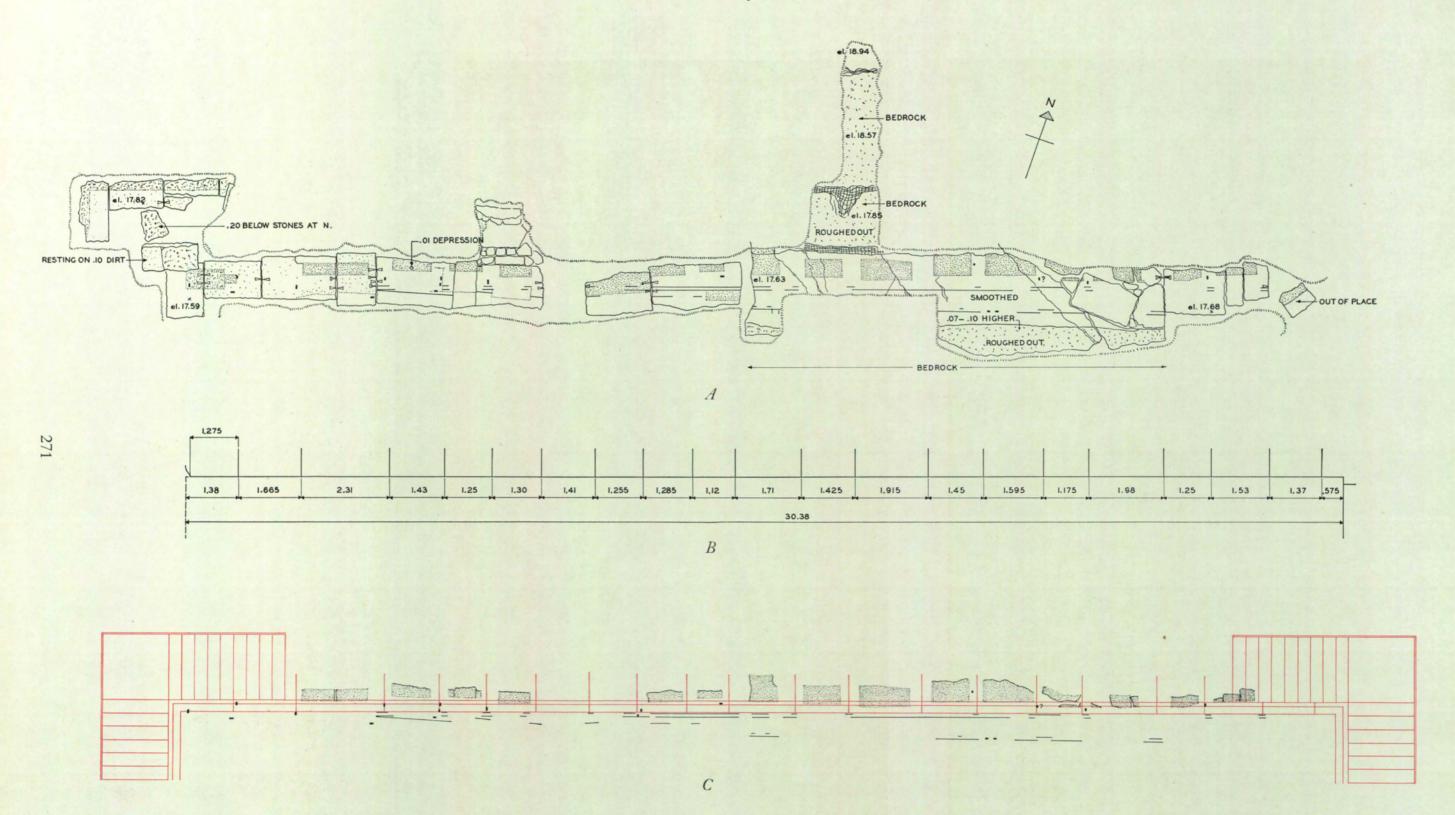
Palace G. Scale, 1:100. A. Plan of Area Tested along South Front of Site. B. Spacing of Stones of Façade of Artaxerxes III (from Palace H).
